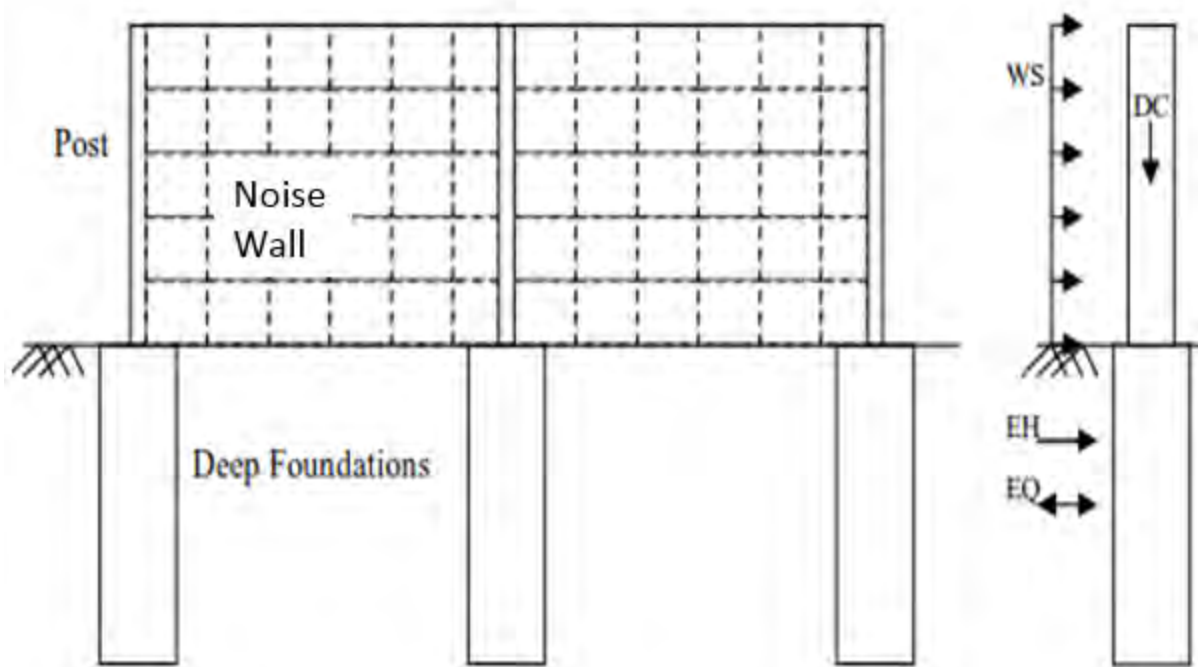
Typical loads on noise walls supported on deep foundations.
